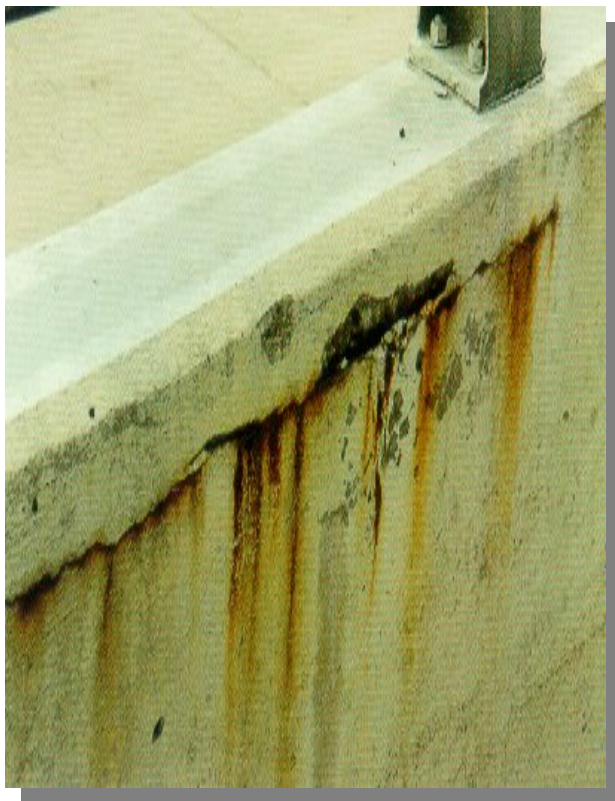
Cracking and rust staining of concrete due to corrosion of reinforcing steel.
